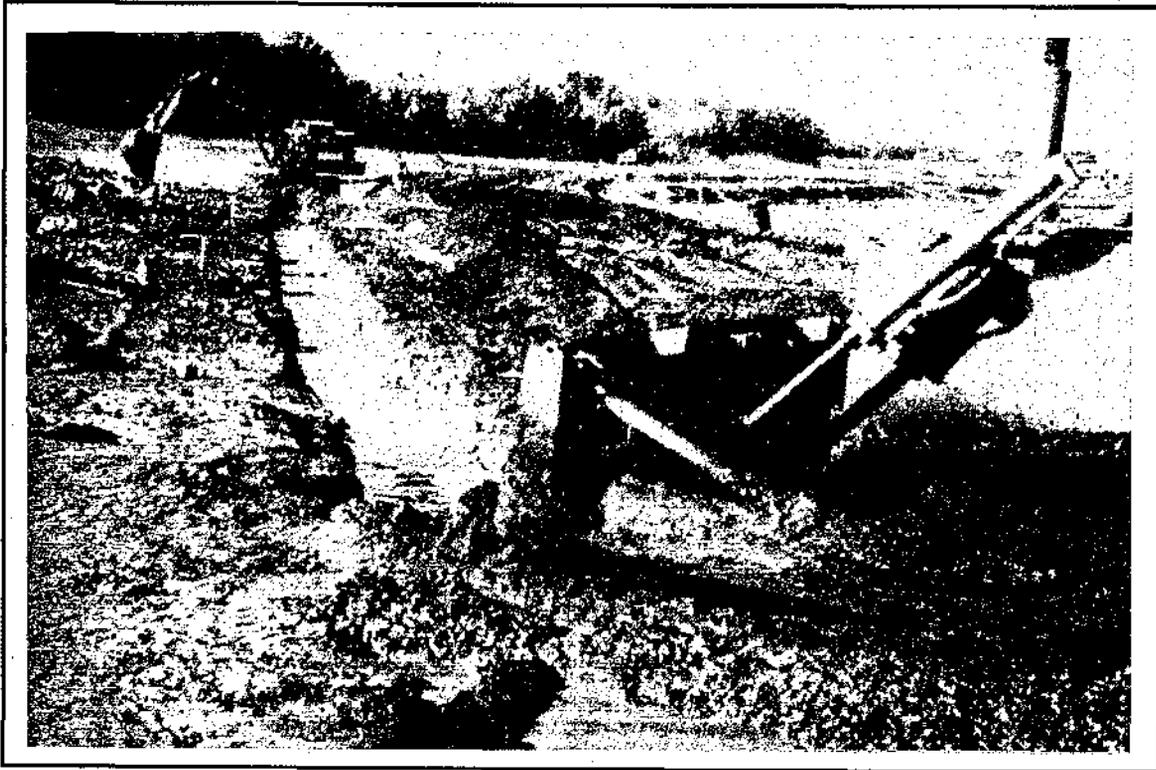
Pushing Soil-Bentonite Backfill Into Slurry Trench with Dozer.
